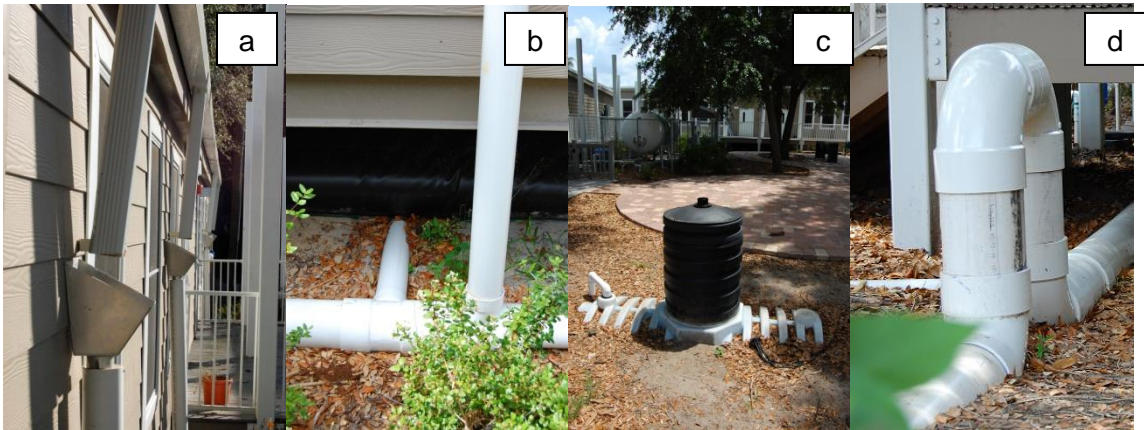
Photos of the rainwater collection system at Learning Gate: (a) gutter piping, (b) storage bladder beneath building, (c) equalization tank, and (d) overflow pipe.
